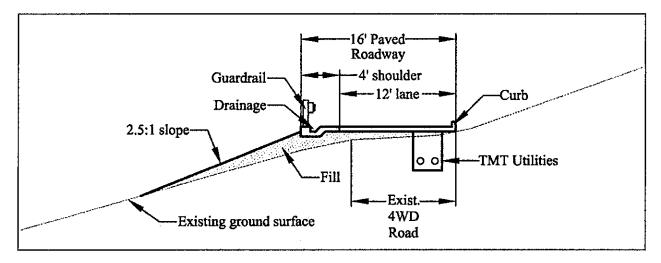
Cross Section of Access Way in Southernmost Cinder Section Overlapping 4-Wheel Drive Road
